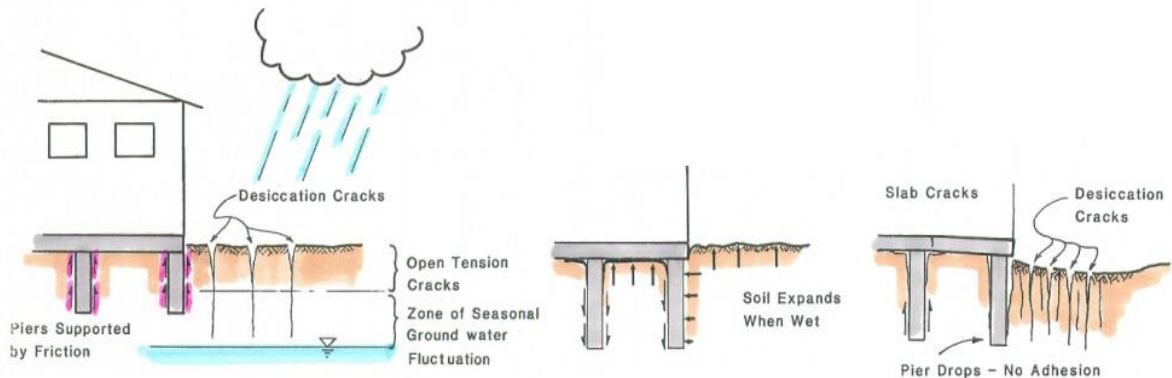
Damage to house supported on shallow piers (Rogers, Olshansky, & Rogers, 2016)
